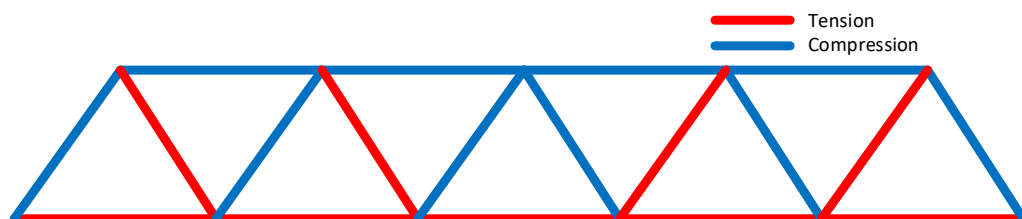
Schematic representation of forces the truss members are subject to for a Warren truss without verticals under bending
